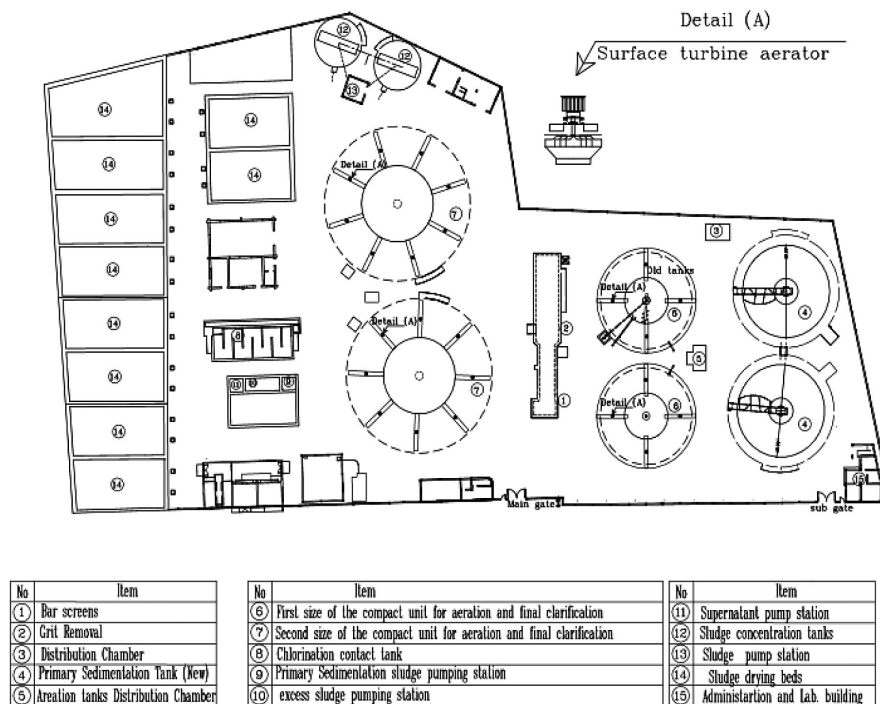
A general layout of the upgraded WWTP located in Meet Abo El-koum village
